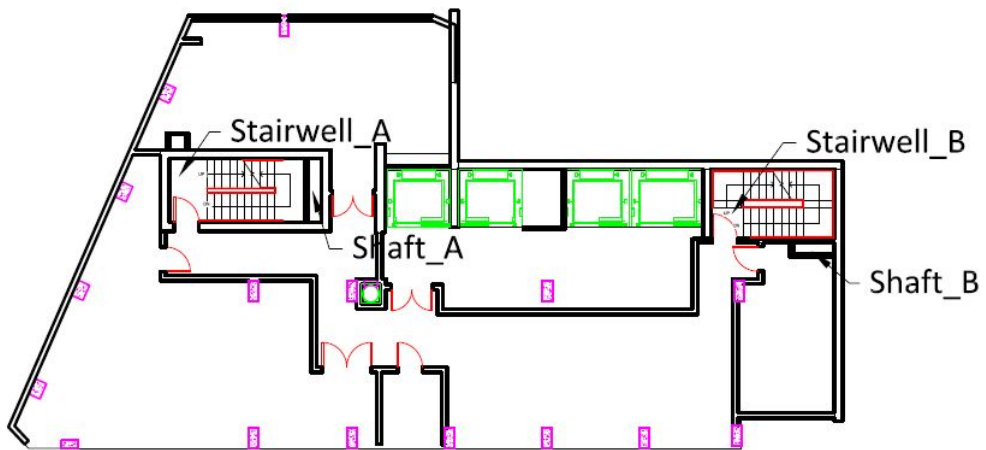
30th floor has an open layout for mechanical equipment.
